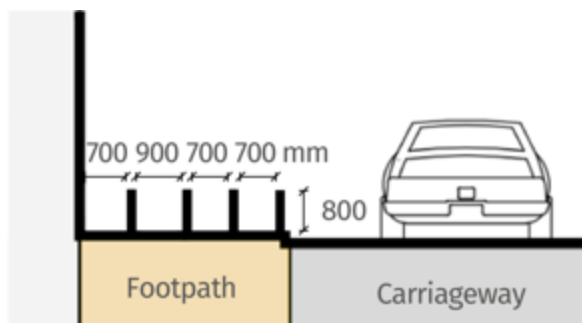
Bollards should be installed to prevent vehicles from parking on footpaths, with spacing of 0.9 m between at least one set of bollards to allow wheelchairs to pass.
